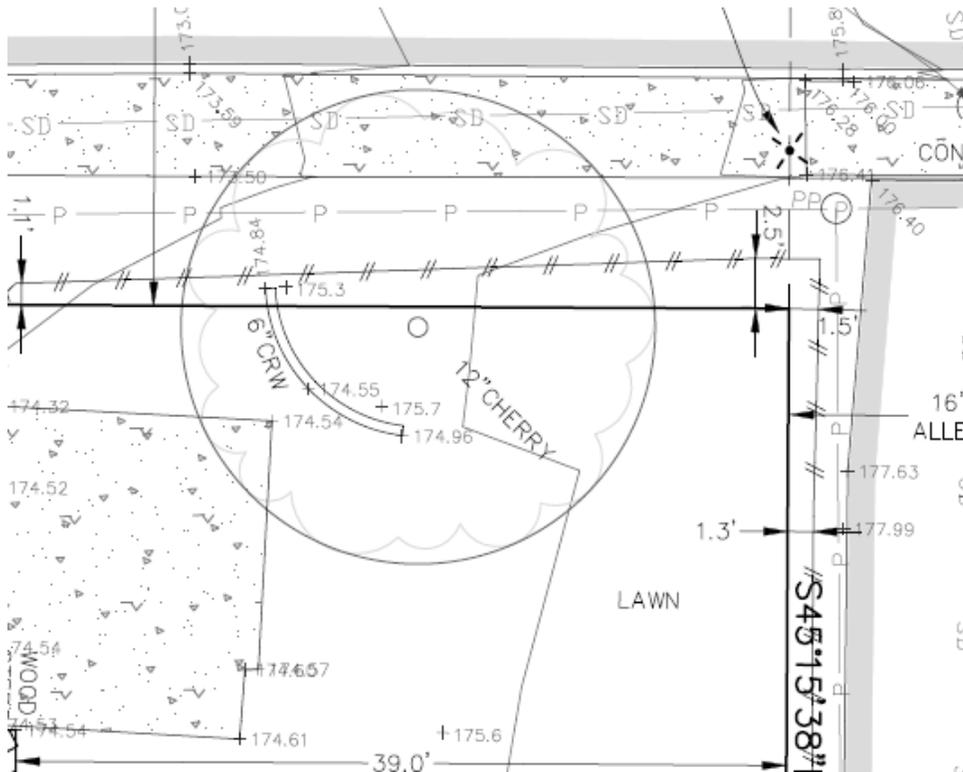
Excerpt from the survey plan showing location of cherry tree.
